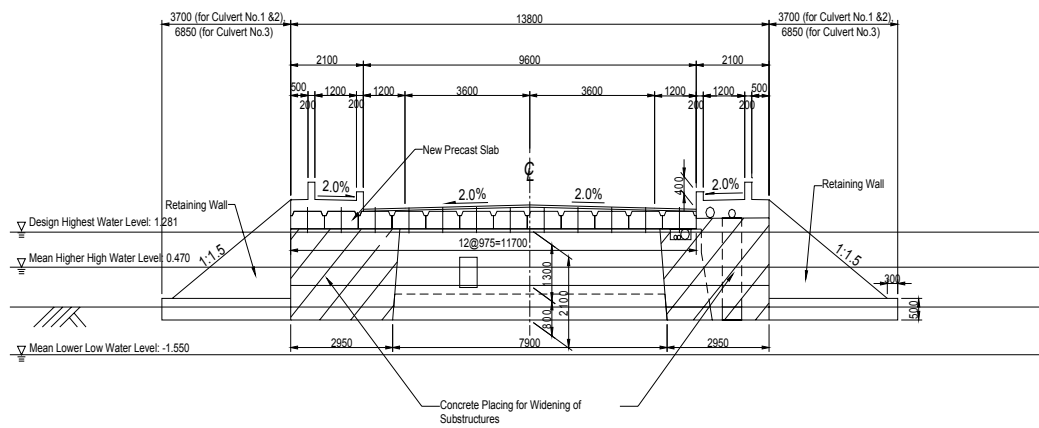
Typical Cross Section of Widened Culverts on Meyungs Causeway
